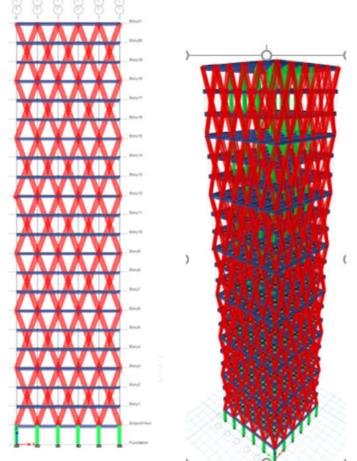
72 -degree diagrid structure elevation and 3D extruded view
